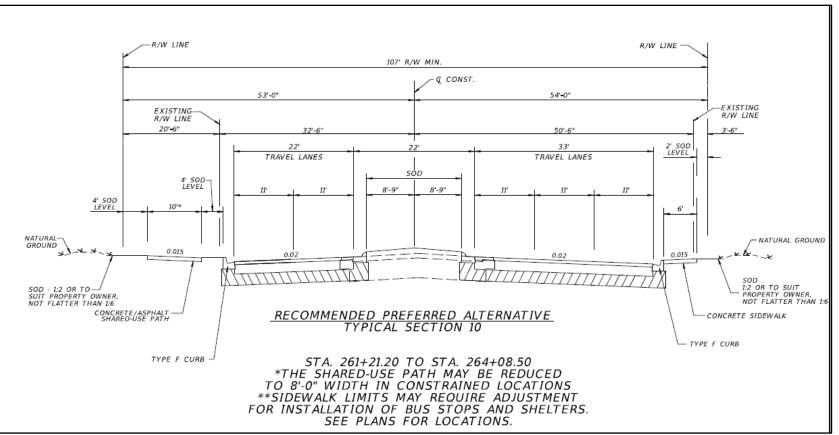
Representative Preferred Alternative Typical Section – West of Plaza Shopping Center
